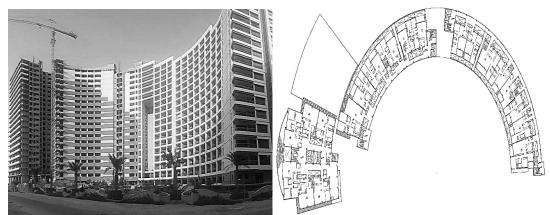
Plan and Elevation of Persian Beach Tower in Kish Island
